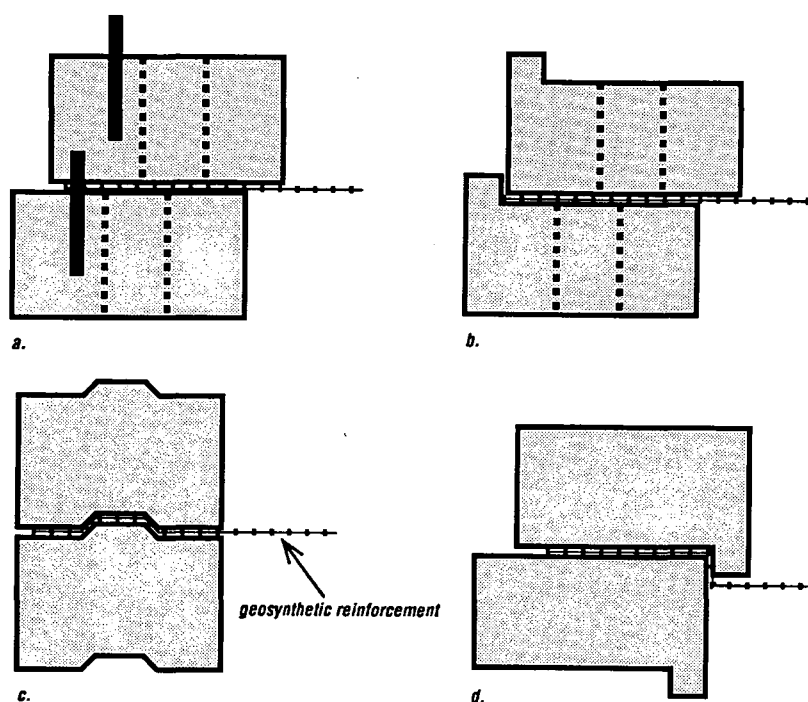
Typical facing block cross sections and connection details: (a) block with alignment/shear pin; (b) block with leading lip; (c) block with shear tray; (d) block with trailing lip.
